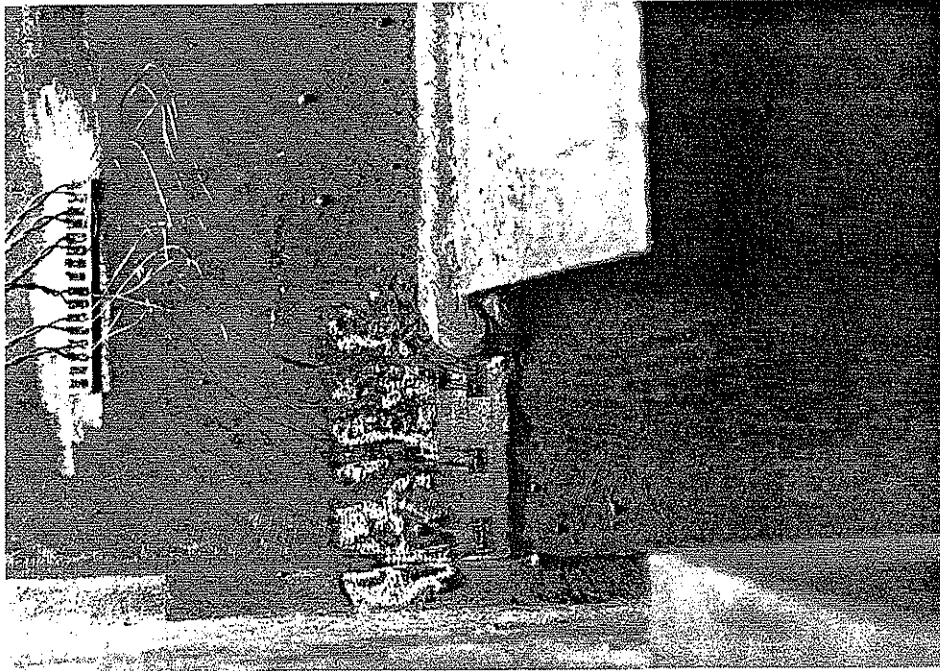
Strain gages installed in web gap between transverse connection plate and web-flange weld
